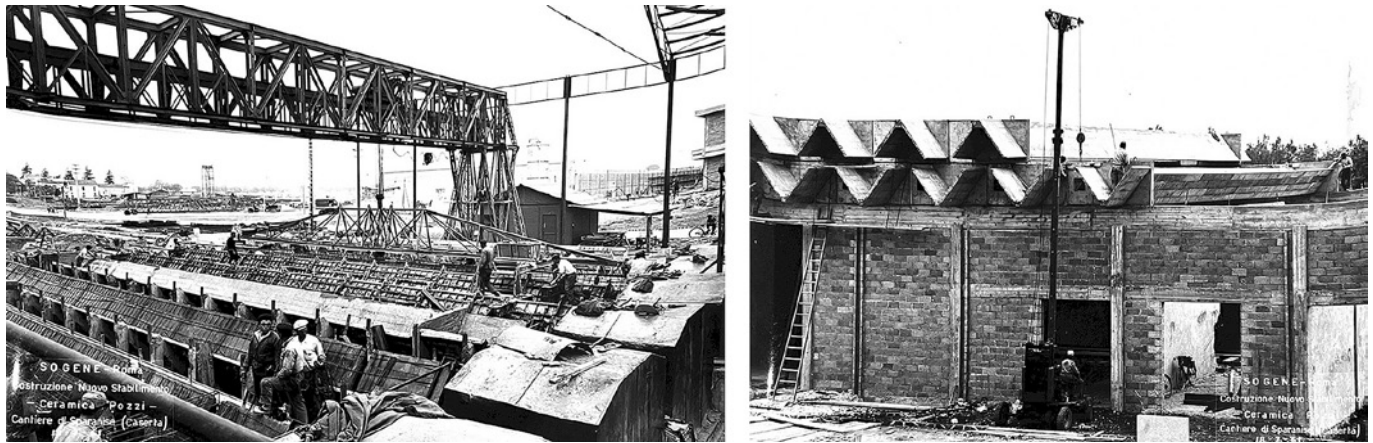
Pozzi Ginori complex in Sparanise, “Vernici” building. Left: view of the V-shaped roof tiles prefabrication site. Right: assembly of the V-shaped roof beams. Source: ACS-SGI, authorization for use n. 2877/2024, folder 4091-71.
